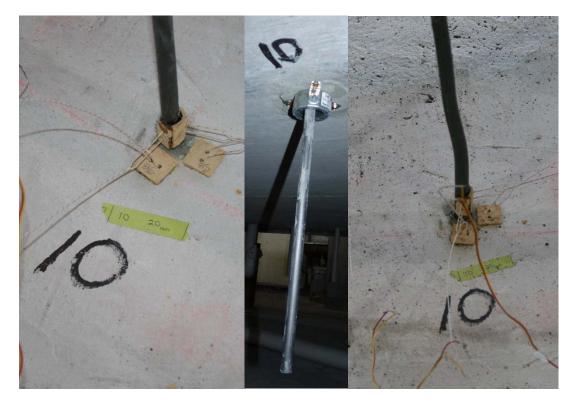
Specimen 11, left to right, unexposed, exposed and unexposed post test
